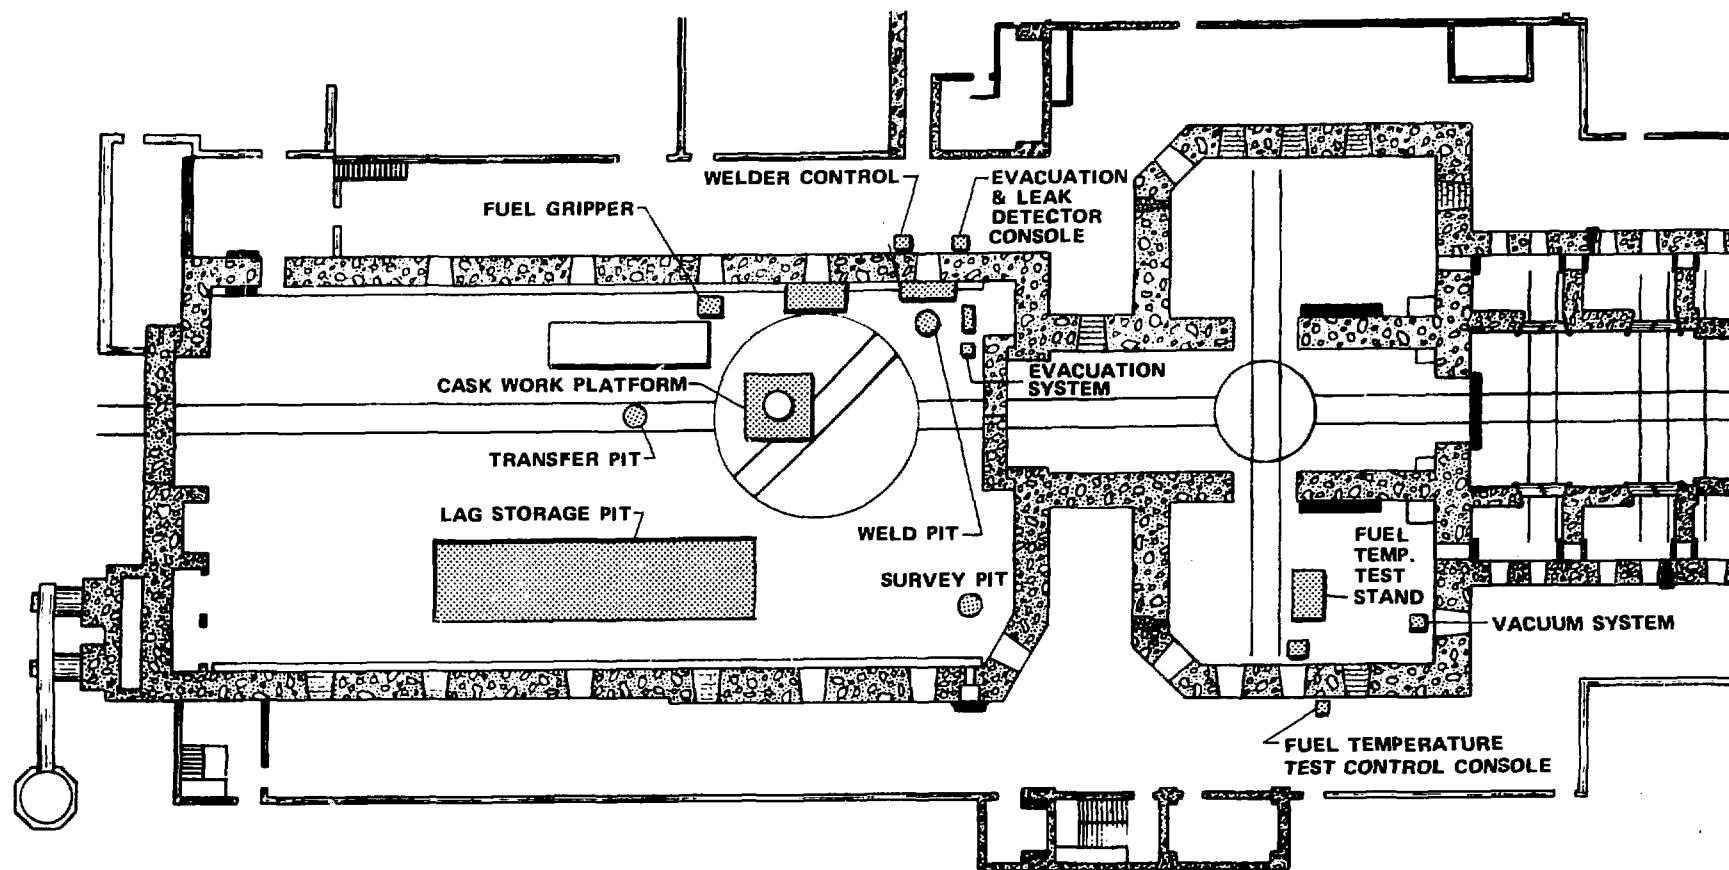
E-MAD First Floor Plan Showing Locations of Demonstration Work Stations and Equipment
